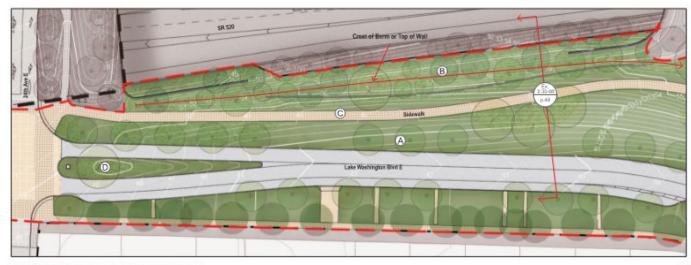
E Lake Washington Blvd east of 24th detail plan
